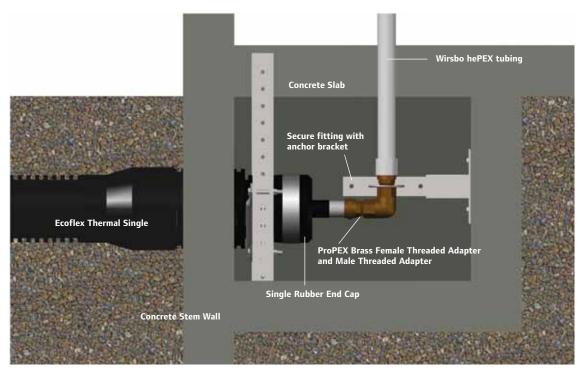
Slab-on-grade Dry Well Installation – Interior Wall Attachment
